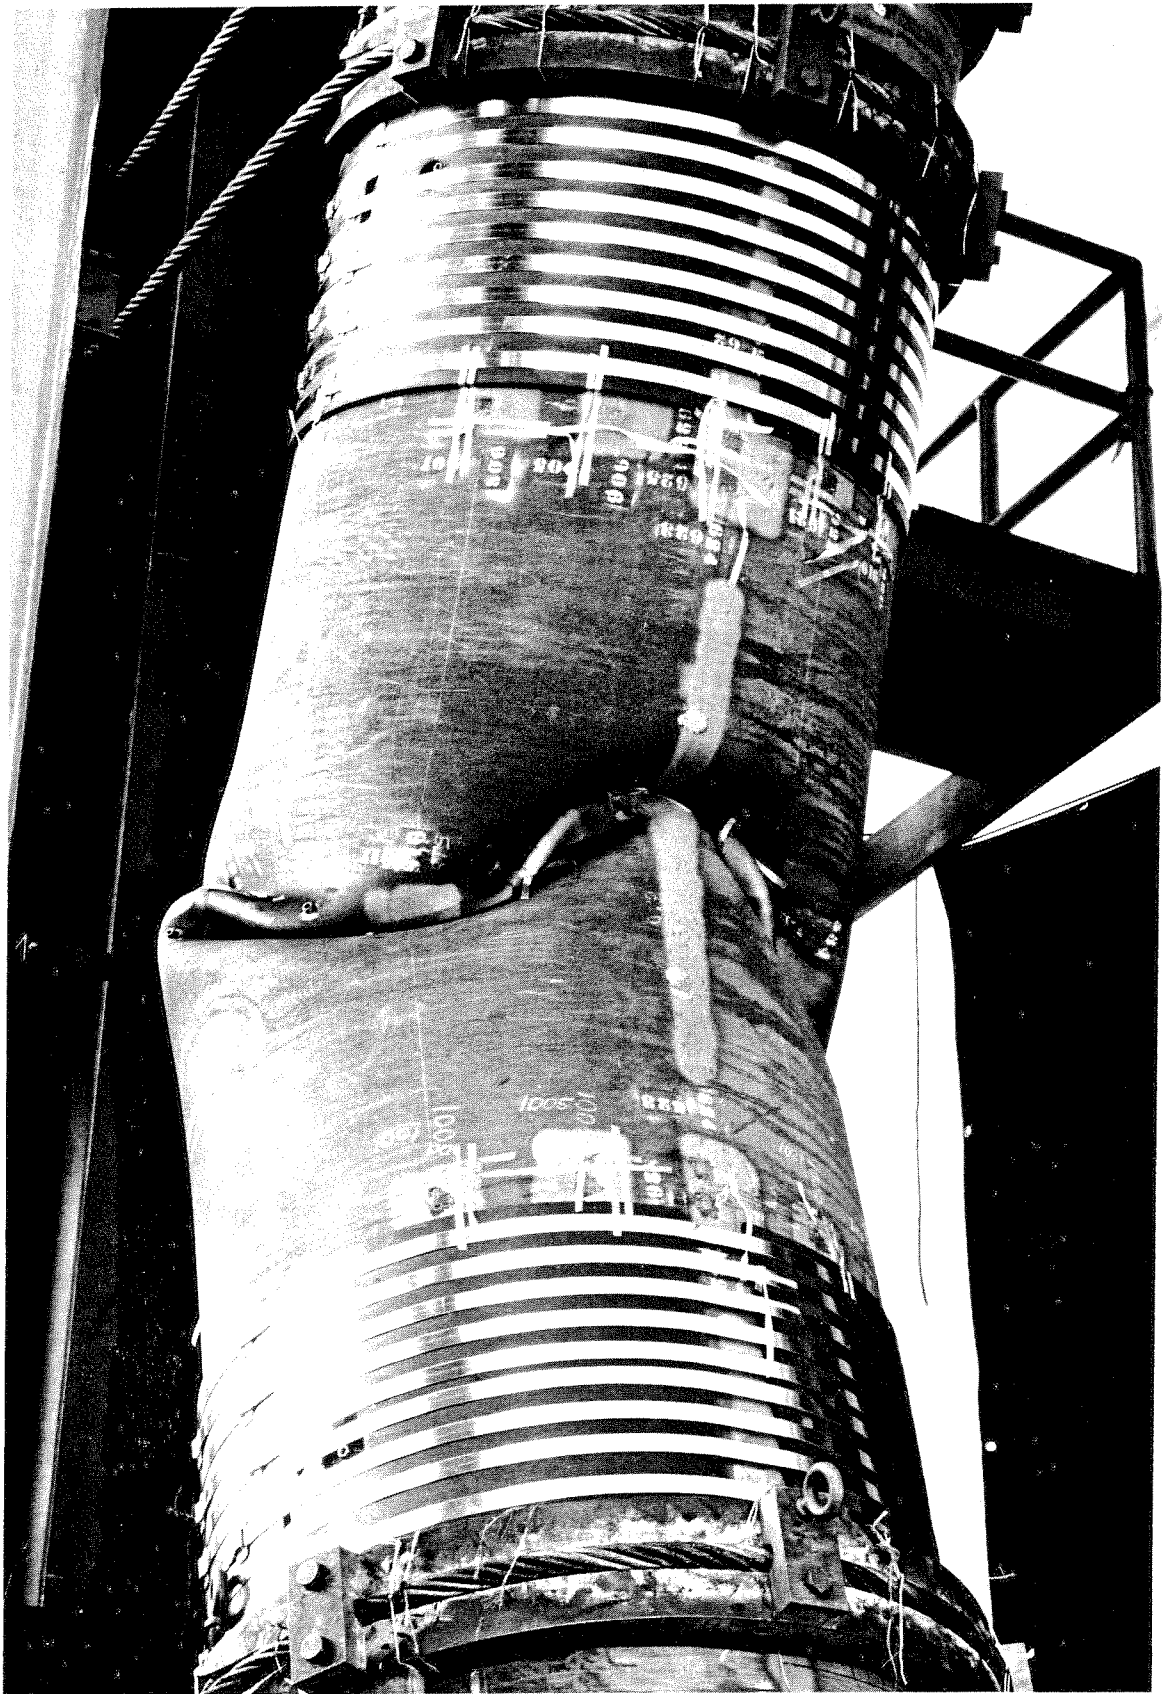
SPECIMEN NO. 6 VIEW OF BUCKLE
